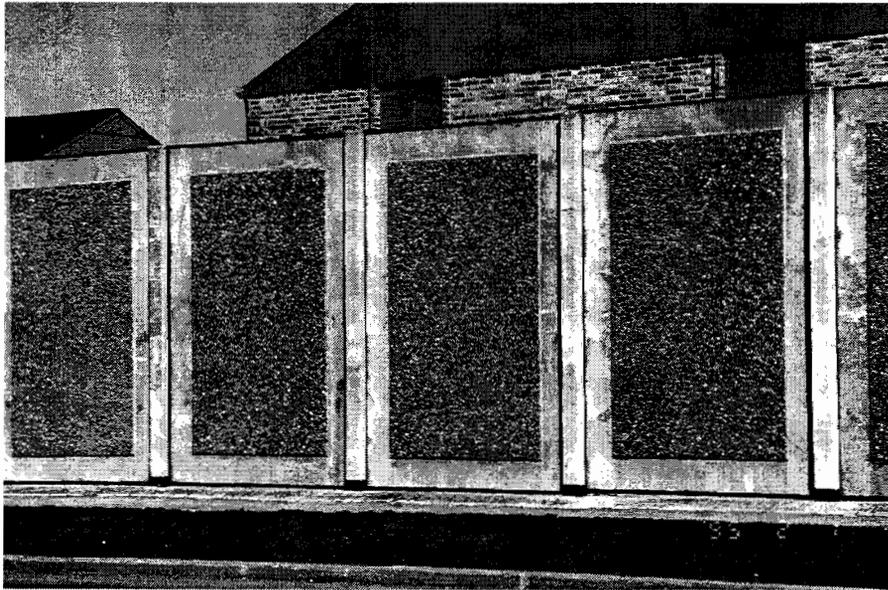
Example of Prefabricated, Separate Post and Panel Noise Barrier (Houston District, precast concrete panels, steel columns with concrete fascia panels)
